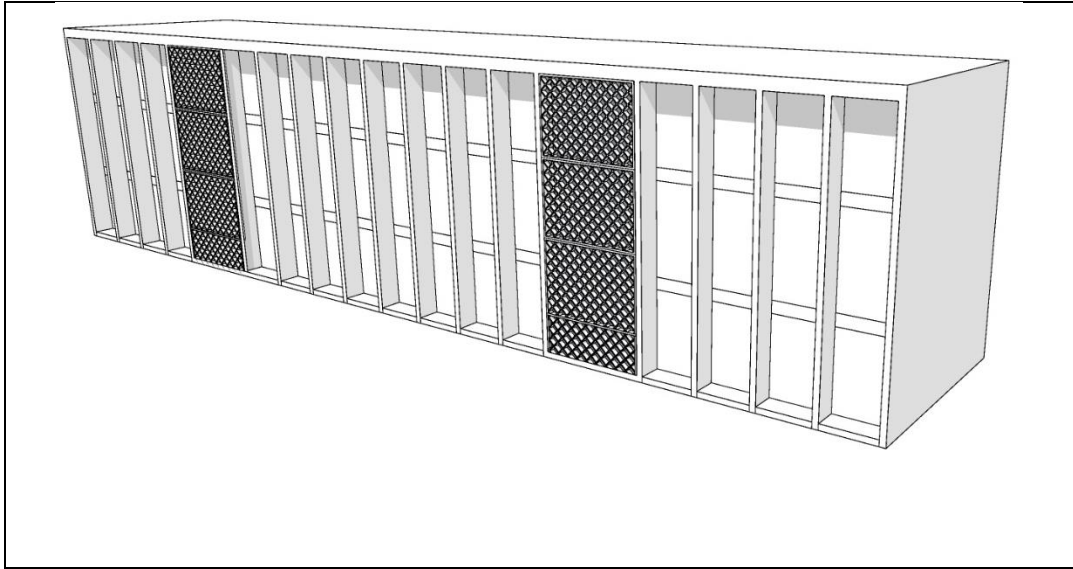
Vertical Shading Devices in East Elevation of Lefkosa Boarding School for Girls, Drawn by Sevil Aydınlık
